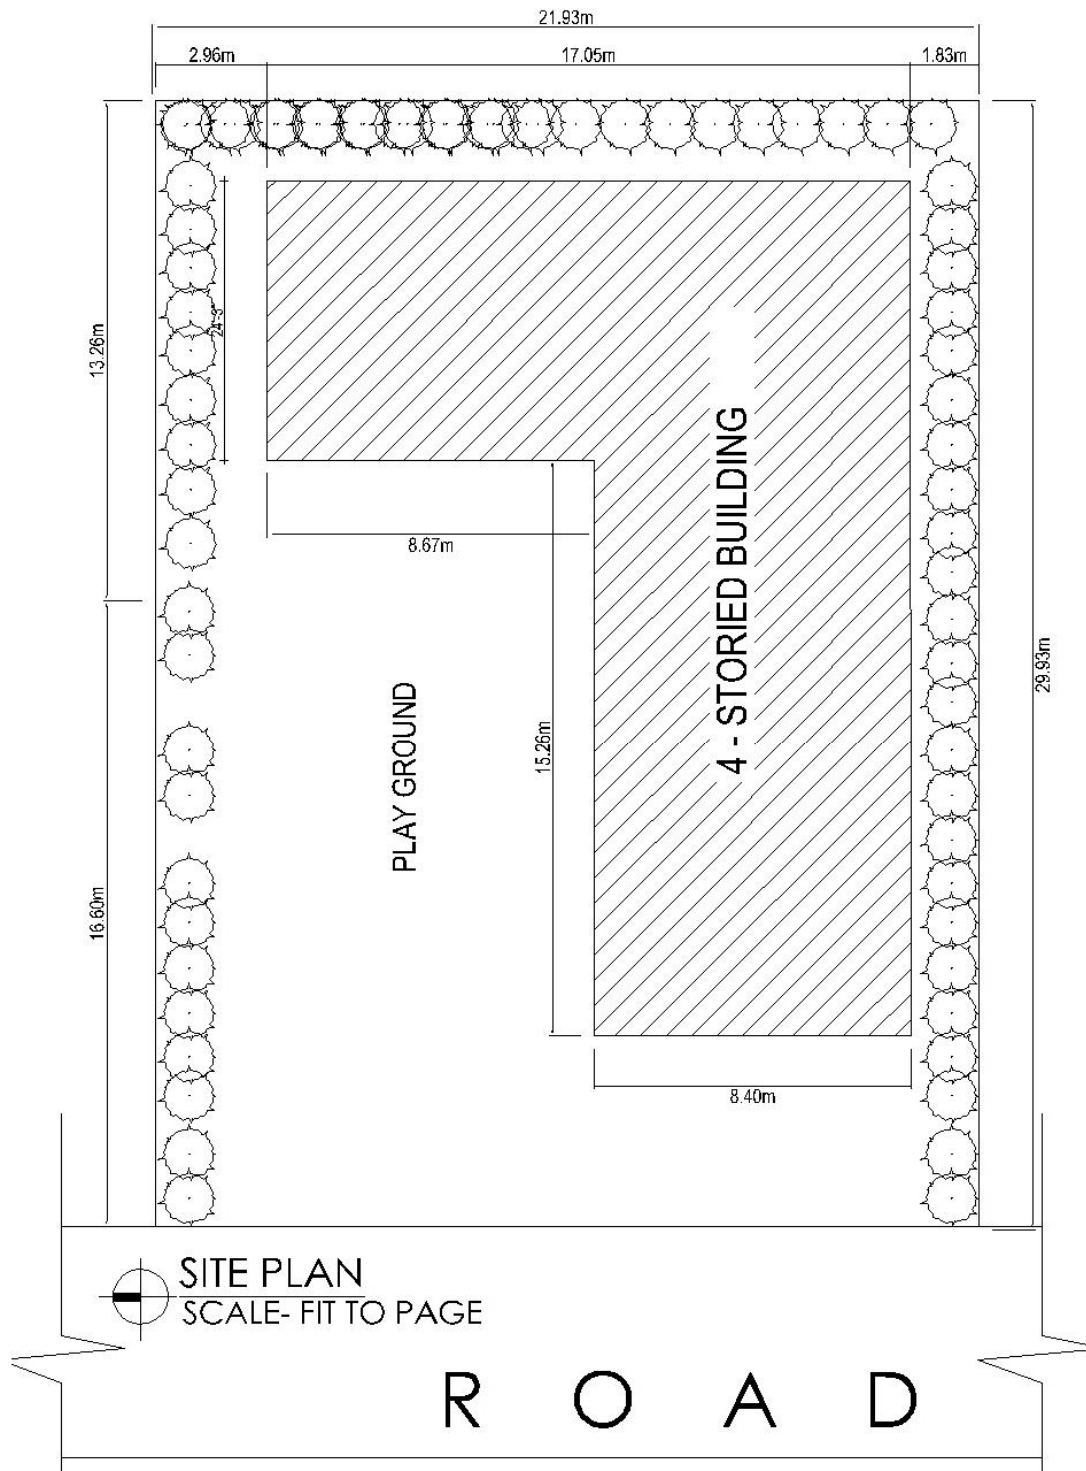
Site plan of LAMABAZAR GOVERNMENT PRIMARY SCHOOL . (Source: author)
